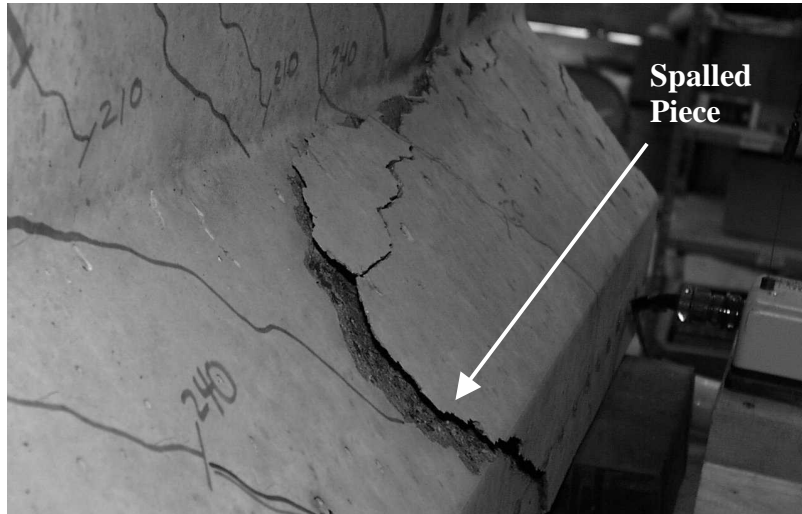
Support Spalling (LW8000-2-N-70)
